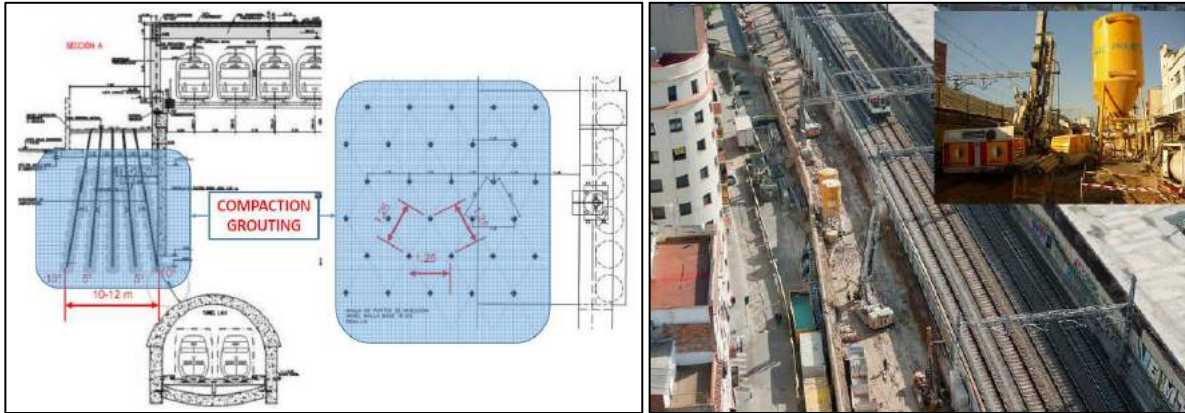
and 3. Adopted solution: Typical section and layout; compaction grout equipment and installation.
